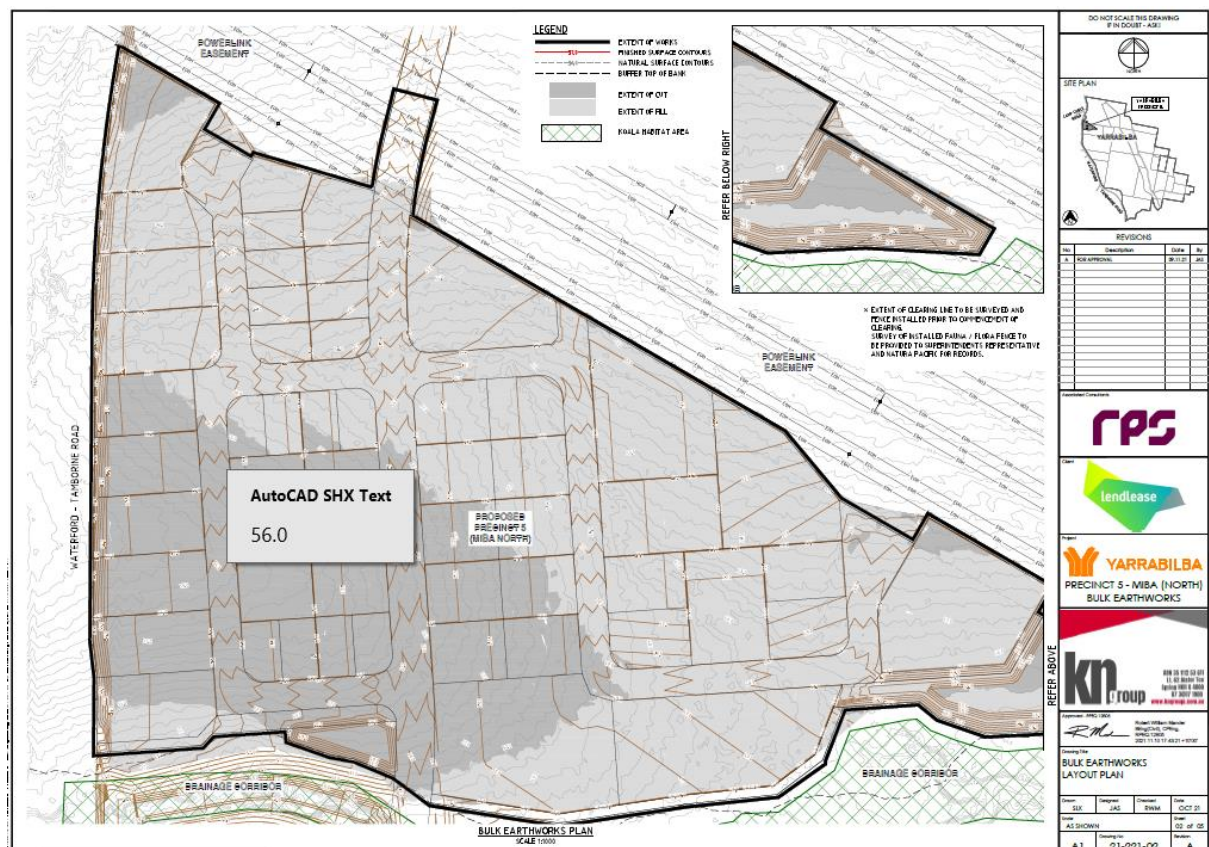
Bulk Earthworks Layout Plan for Precinct 5 – MIBA (North) Provided by KN Group
